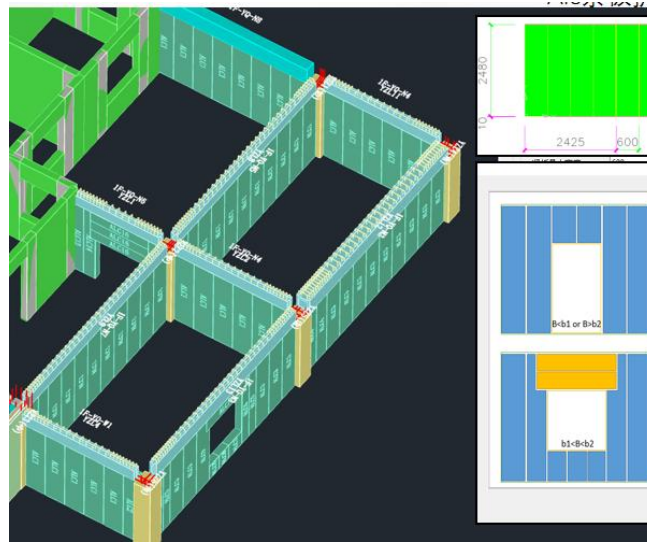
The designation and subdivision functions for prefabricated partition walls (ALC, assembled with slats) in YJK's built-in prefabricated building design software
